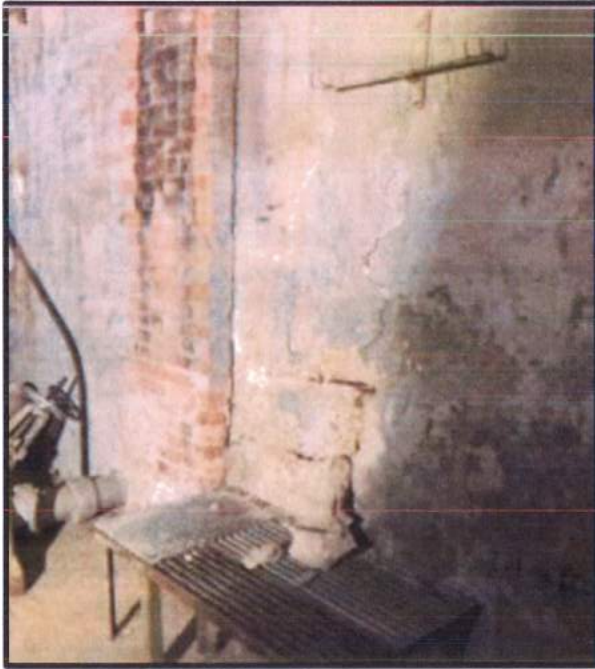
Concrete Spalling and Deterioration at Pipe Gallery Foundation Wall
